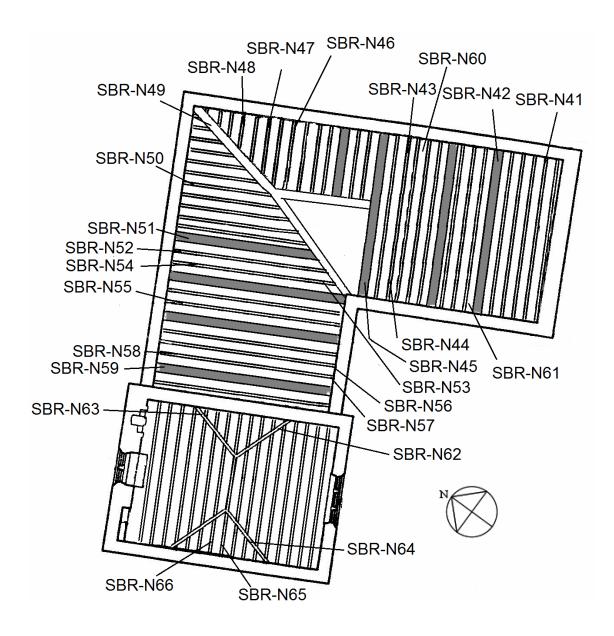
First-floor plan, showing the location of samples SBR-N41-66 (Blackett-Ord Conservation)
